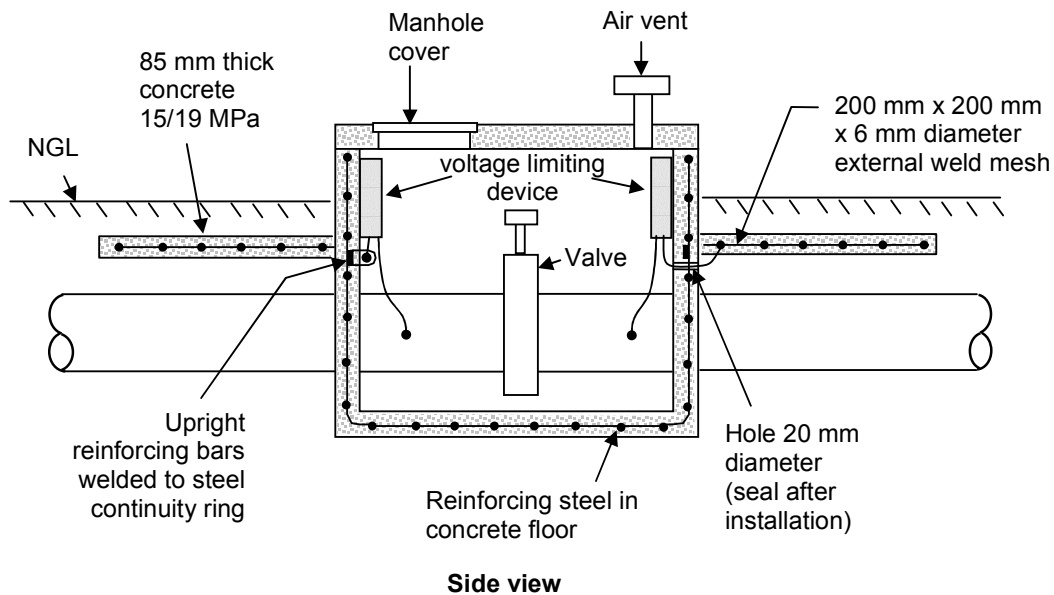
Valve chamber with external weld mesh gradient control mat
